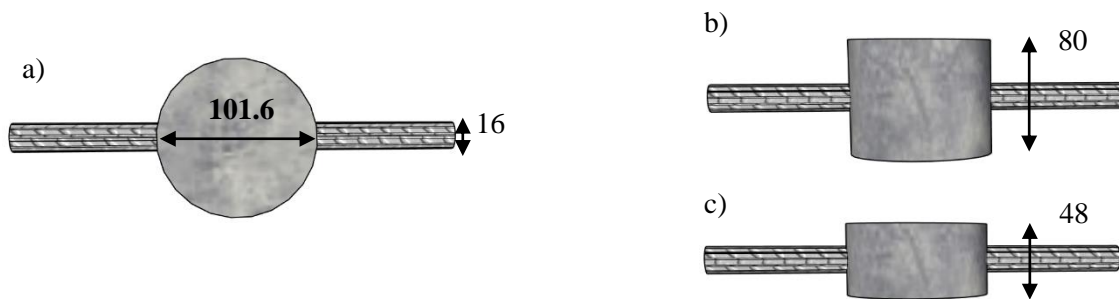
Specimen Dimensions in mm. a) Top Cross-section. b) Side View of Thick Specimens. c) Side View of Thin Specimens.
